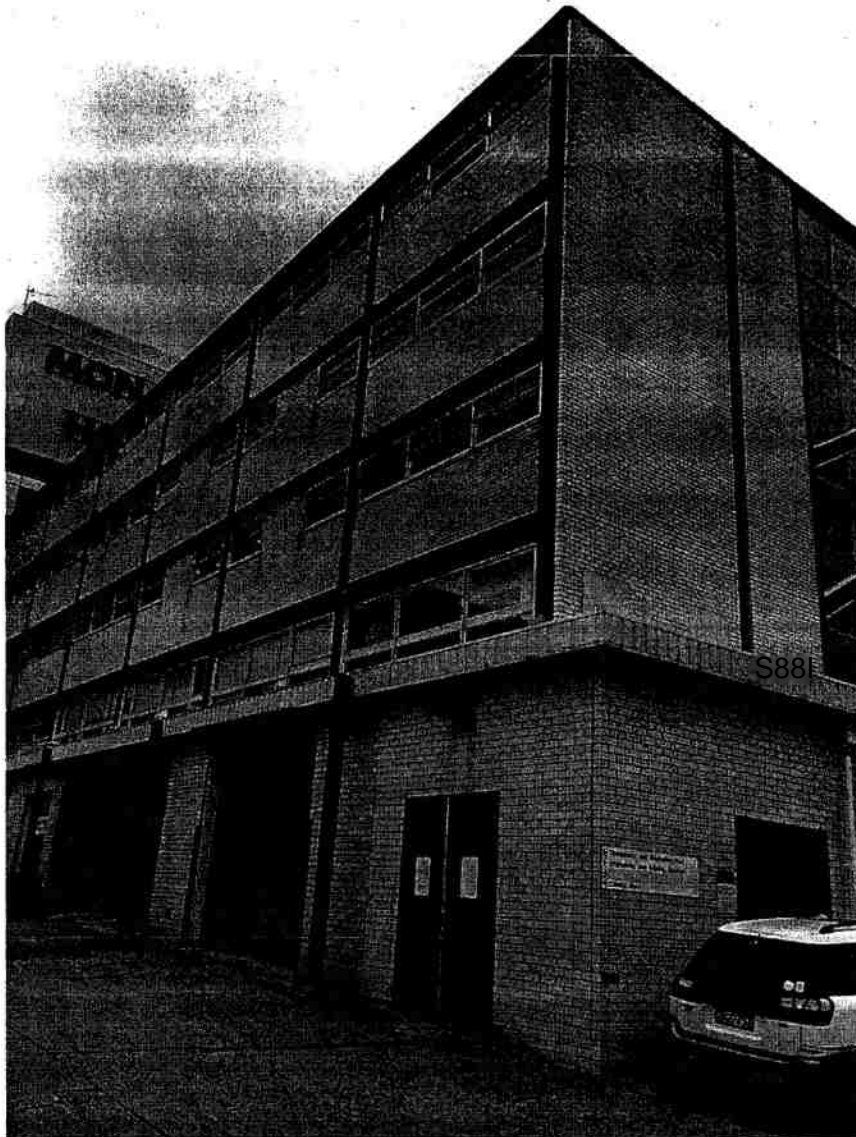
(Area 2.2) - Wall connecting North-West and Southern Elevation
